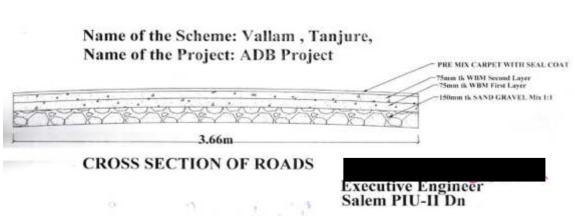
Typical Cross Section for Approach Road and Internal Roads
